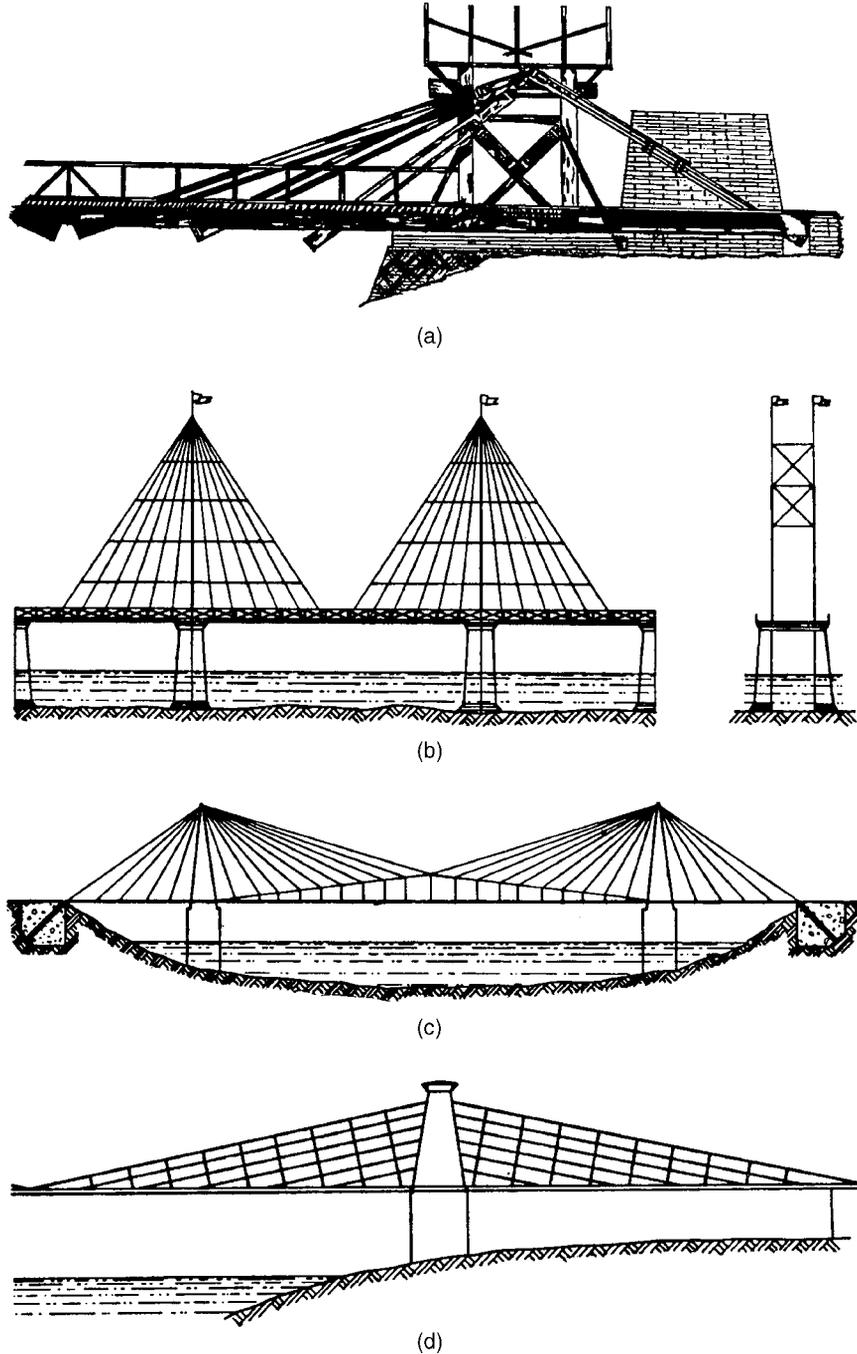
(a) Löscher-type timber bridge. (b) Poyet-type bridge. (c) Gisclard–Arnodin-type sloping-cable bridge. (d) Hatley chain bridge. (Reprinted with permission from H. Thul, “Cable-Stayed Bridges in Germany,” *Proceedings of the Conference on Structural Steelwork, 1966*, The British Constructional Steelwork Association, Ltd., London.)
